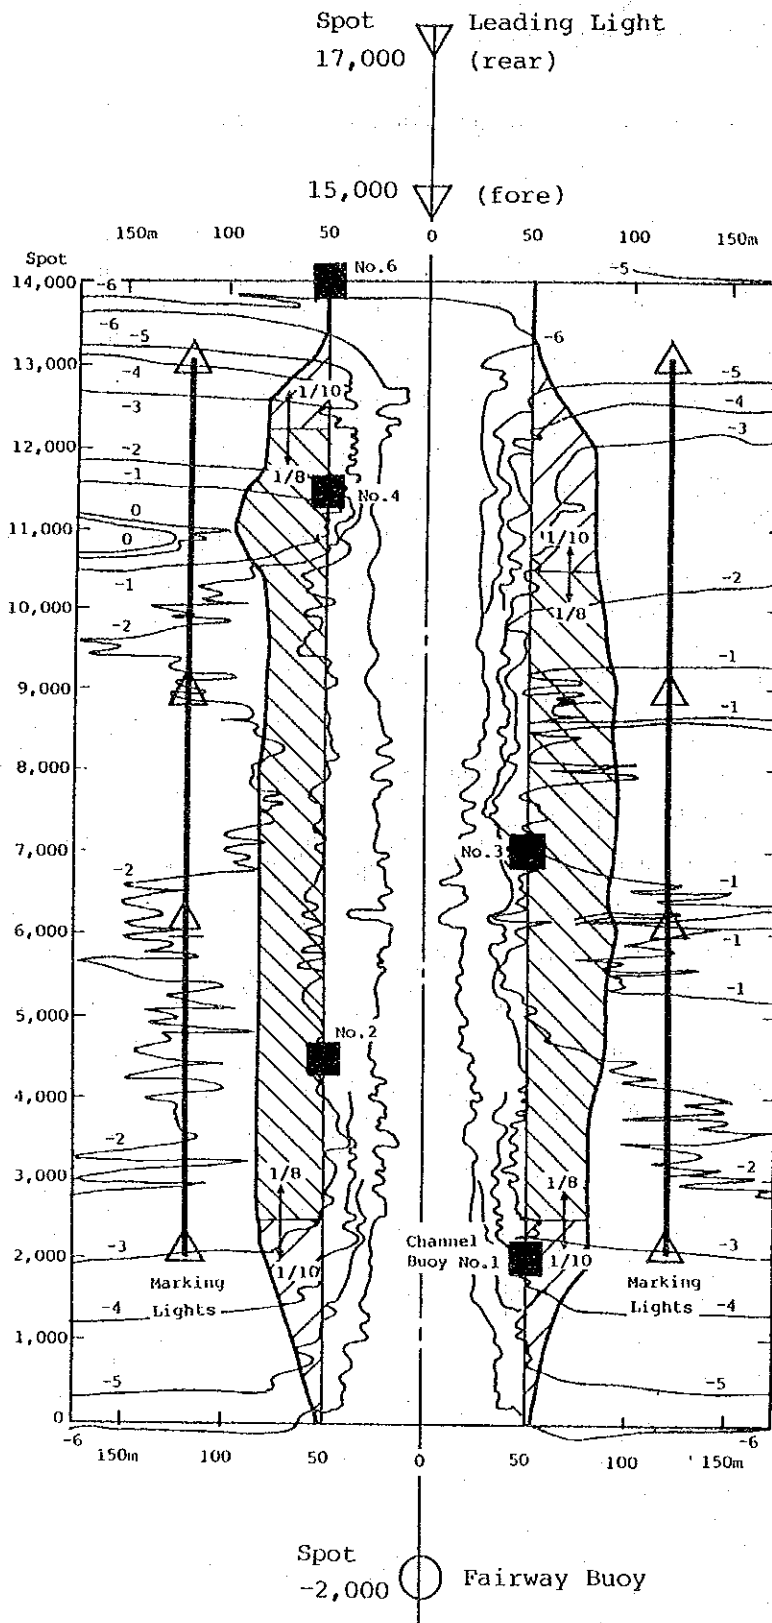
Arrangement of Submerged Walls and Navigational Aids (Comprehensive Plan)
